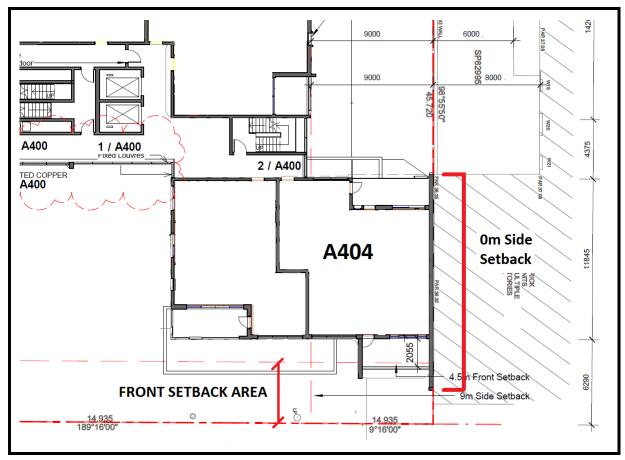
Floor plan showing Zero Side Setback to Northern Boundary
